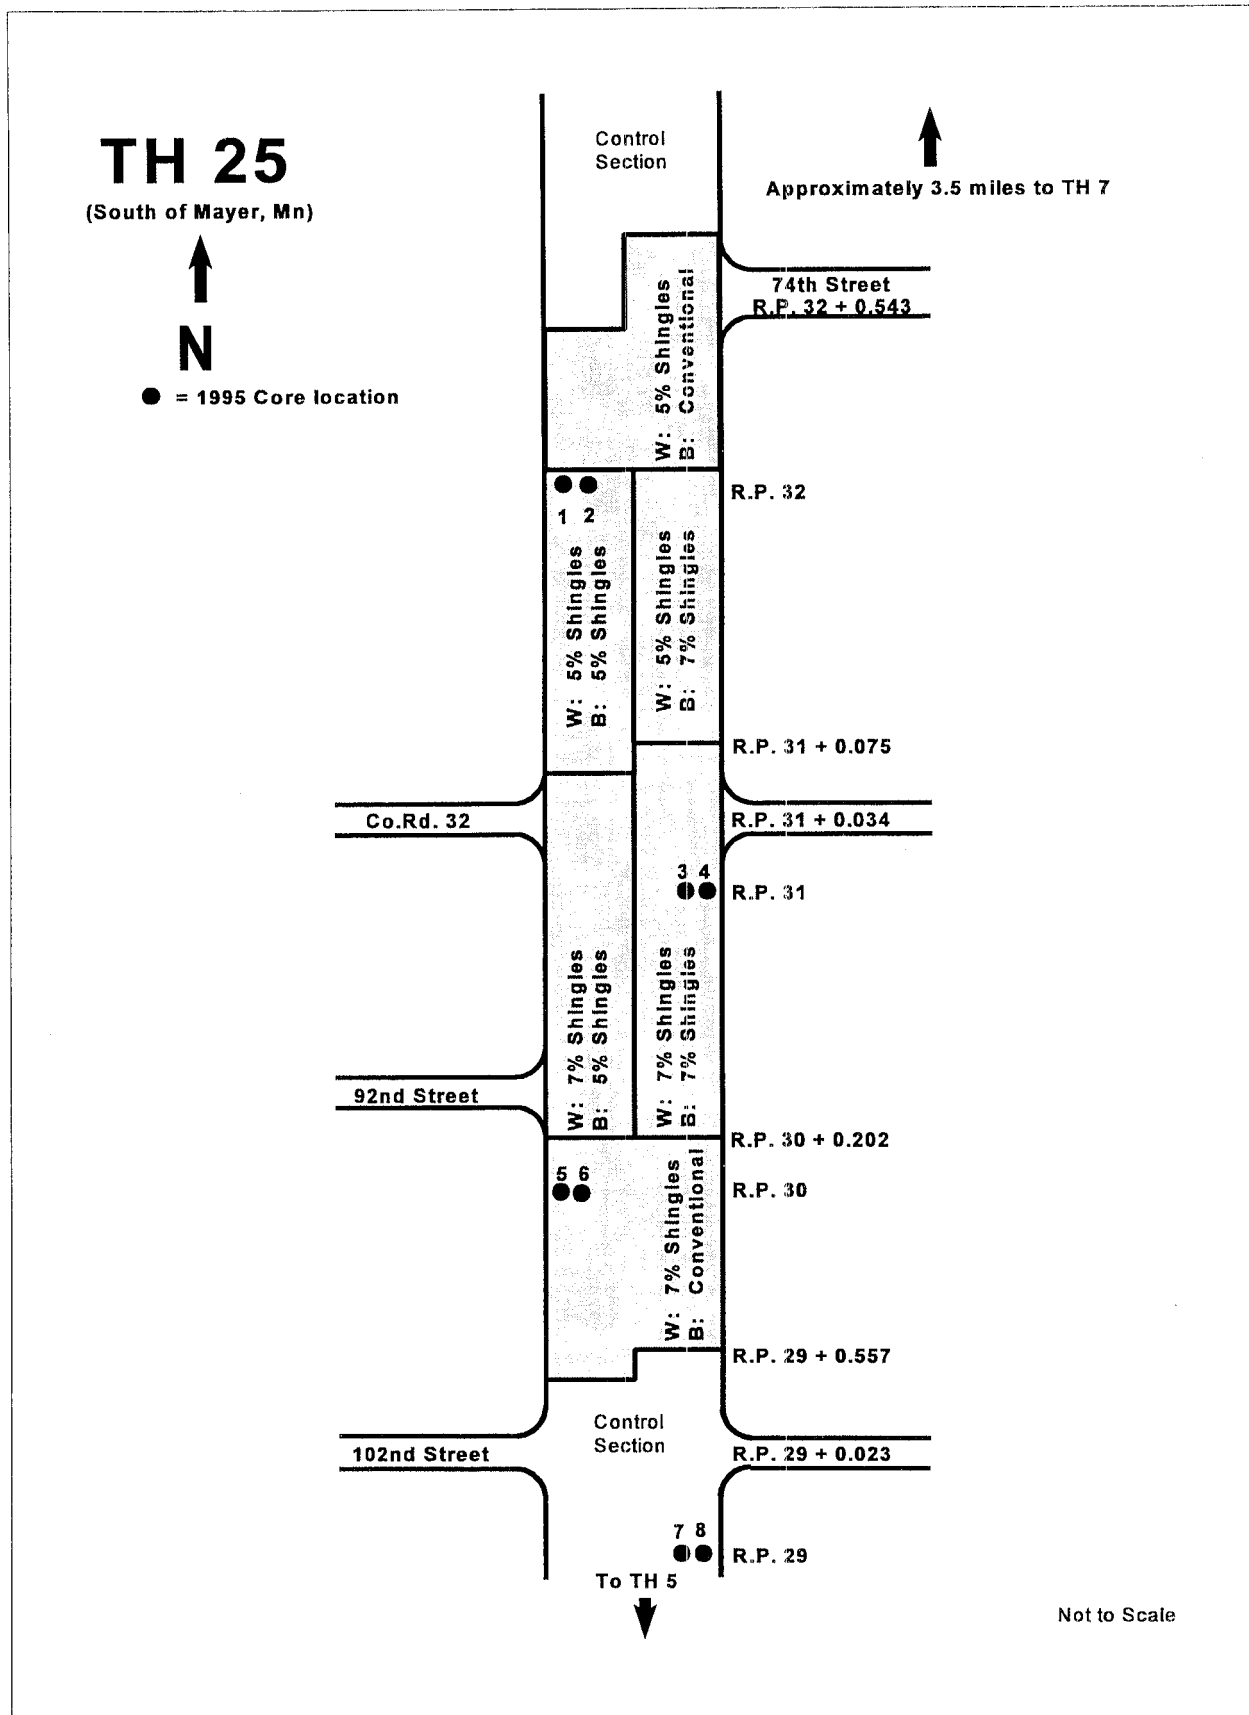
Layout of TH 25 Shingle Scrap Test Sections
